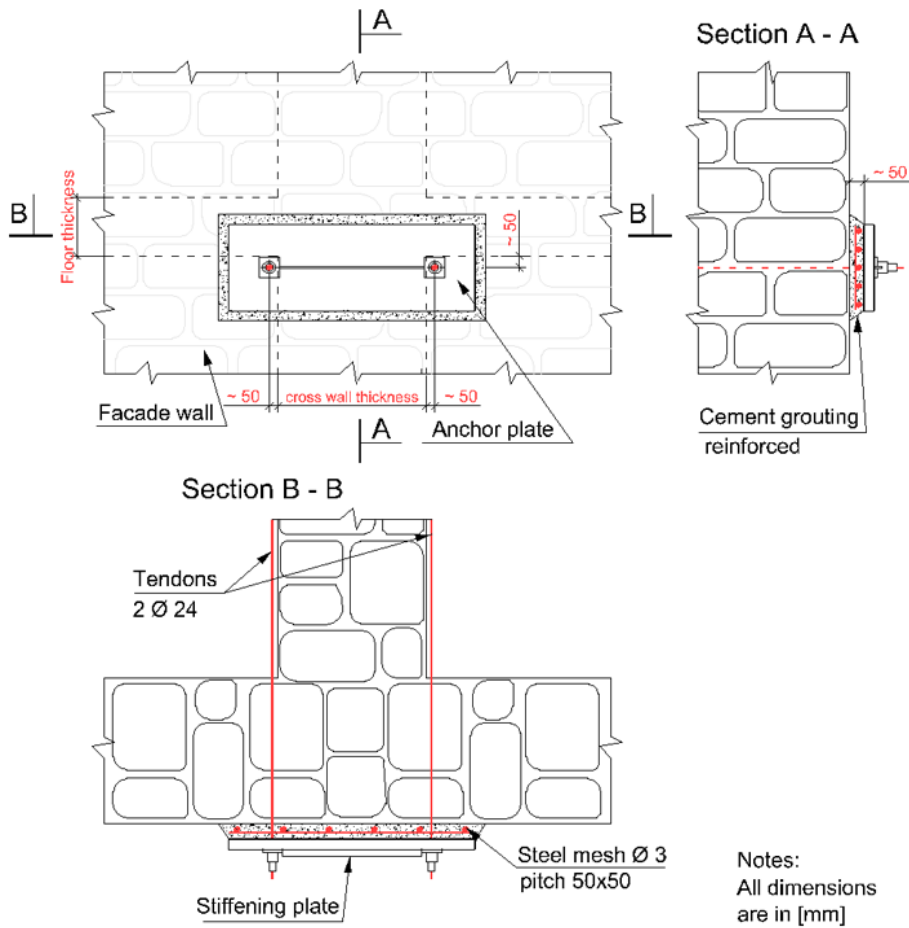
Detail for tying of walls at T junction using steel ties [46]
